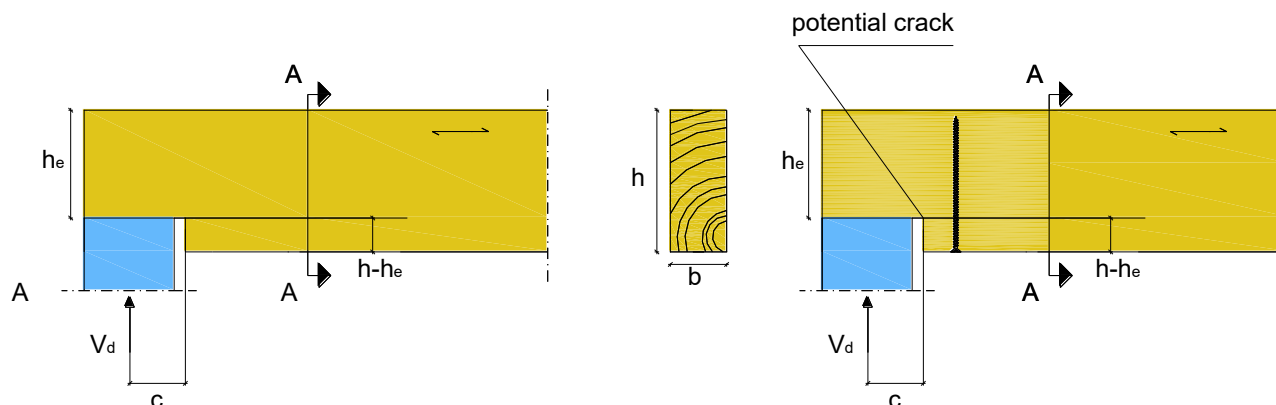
Example for tensile reinforcement of a notched beam support
